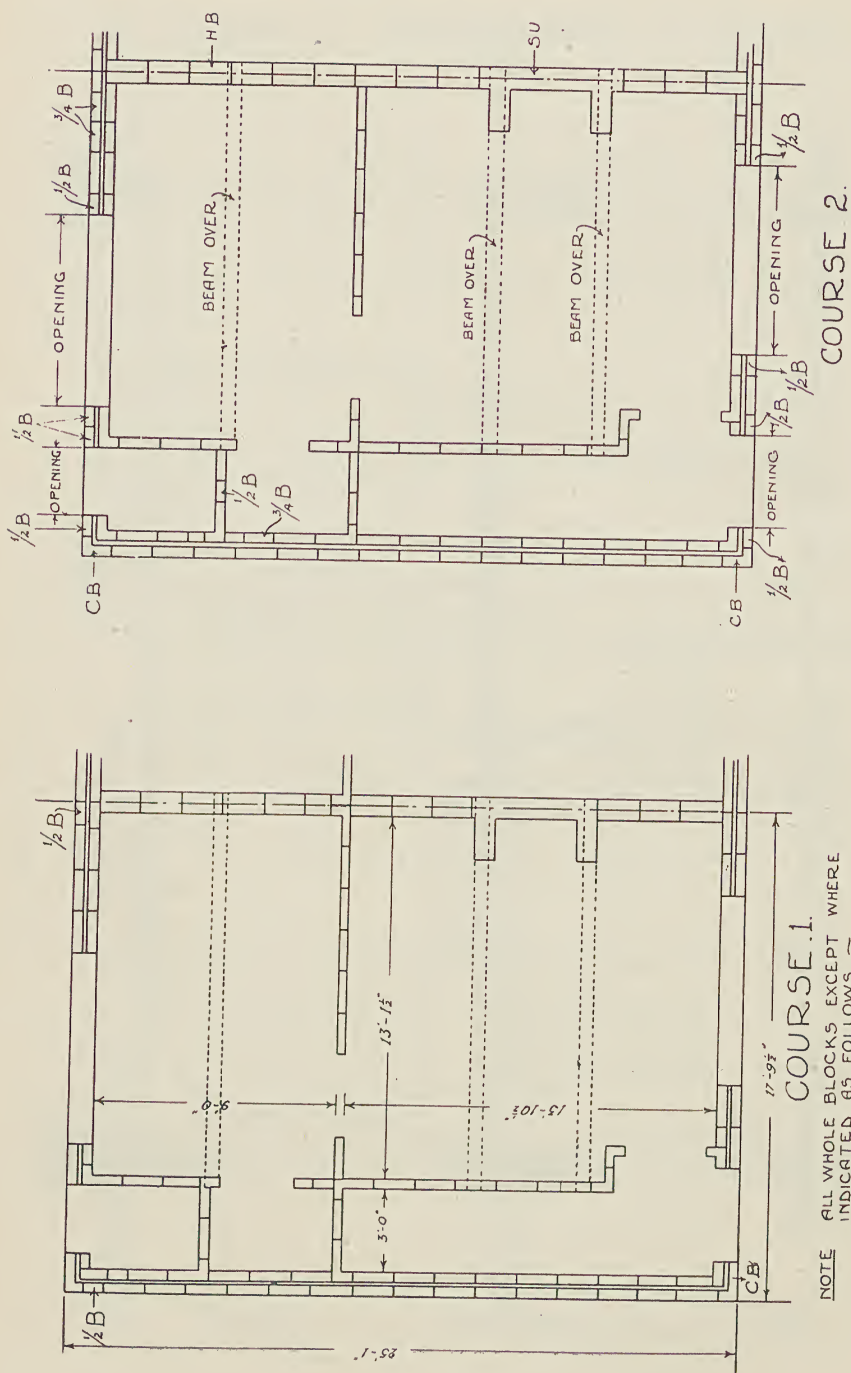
TYPE No. 1: PLANS SHOWING BONDING OF BLOCKS.
